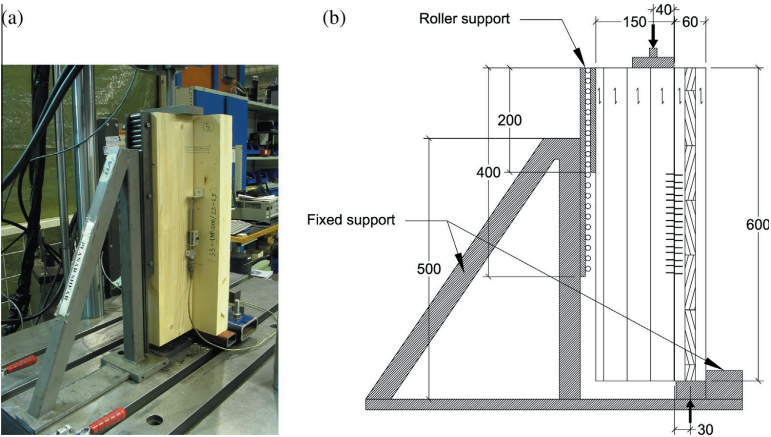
Test setup and loading arrangement for shear tests (dimensions in mm).
